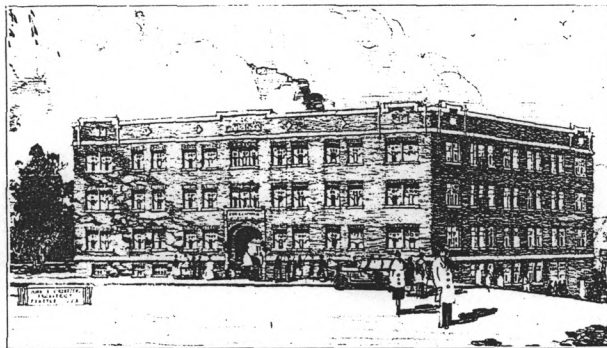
Artist rendering, ca. 1920s, of the Union Arms Apartments, located at East Union Street and Boylston Avenue. Designed by John A. Creutzer, Architect.
